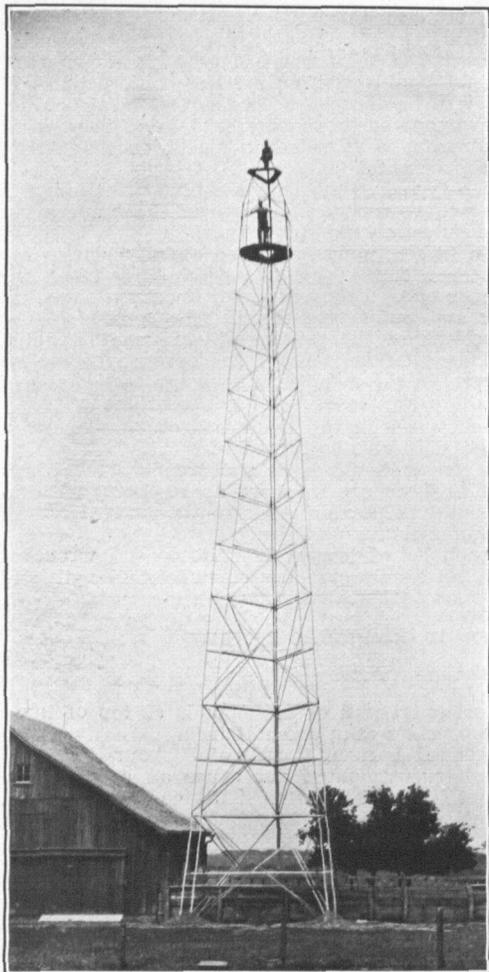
Ninety-foot Bilby steel tower, complete
